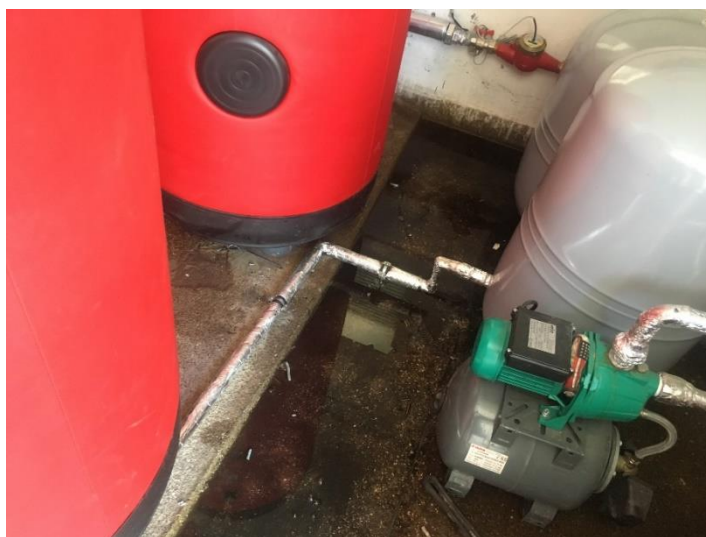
Internat Faidouzi expansion vessel, installed on domestic hot water side.
